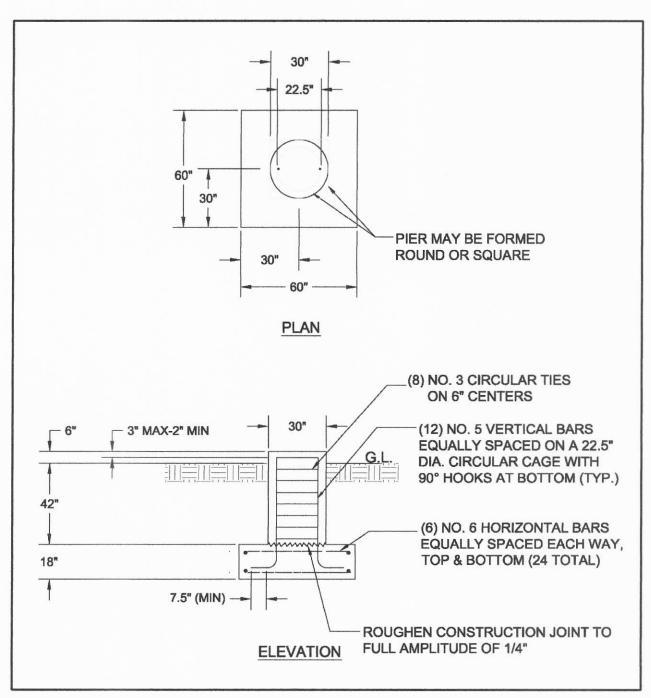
Pier-Pad Base Foundation for GL 60-120 Towers
